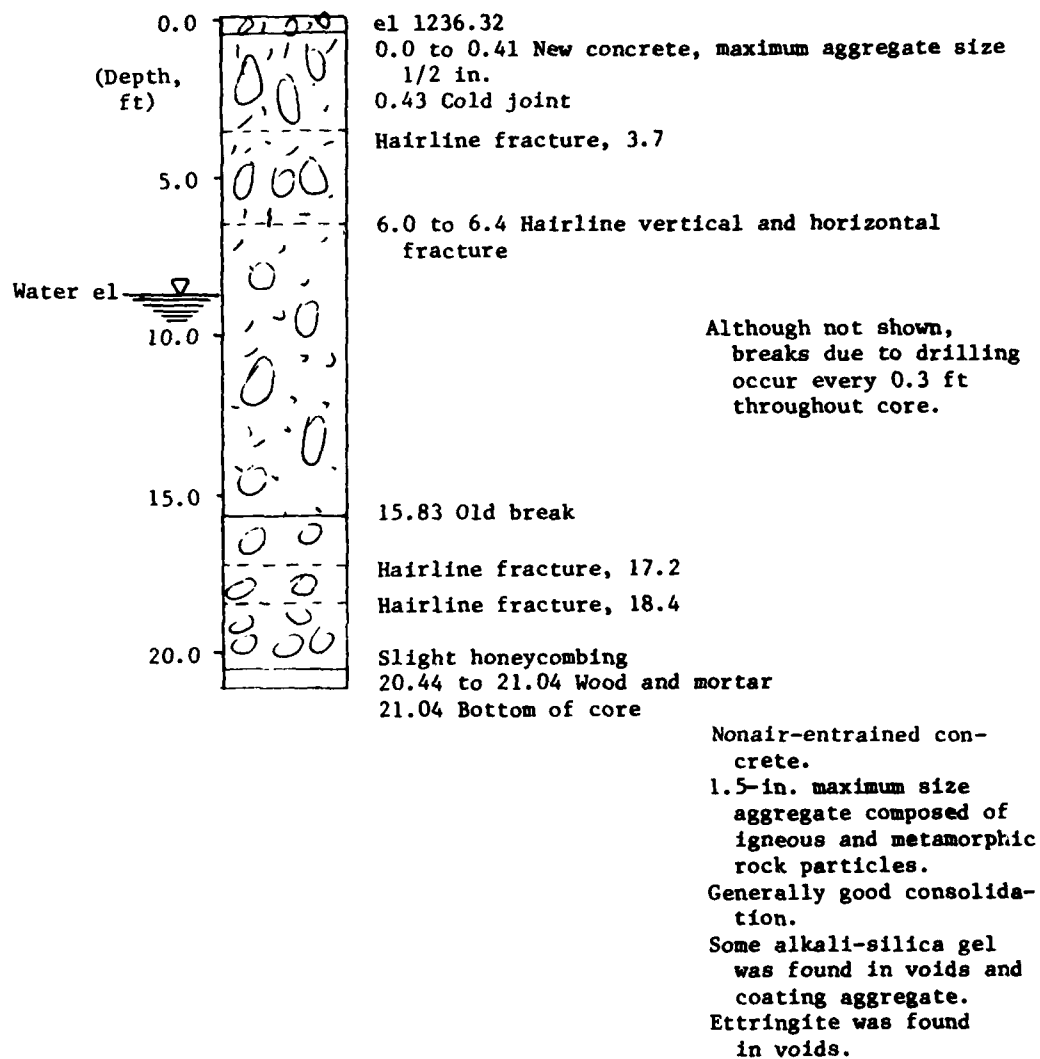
Vertical 4-in.-diam concrete core, PR-P3A, Pine River Dam
